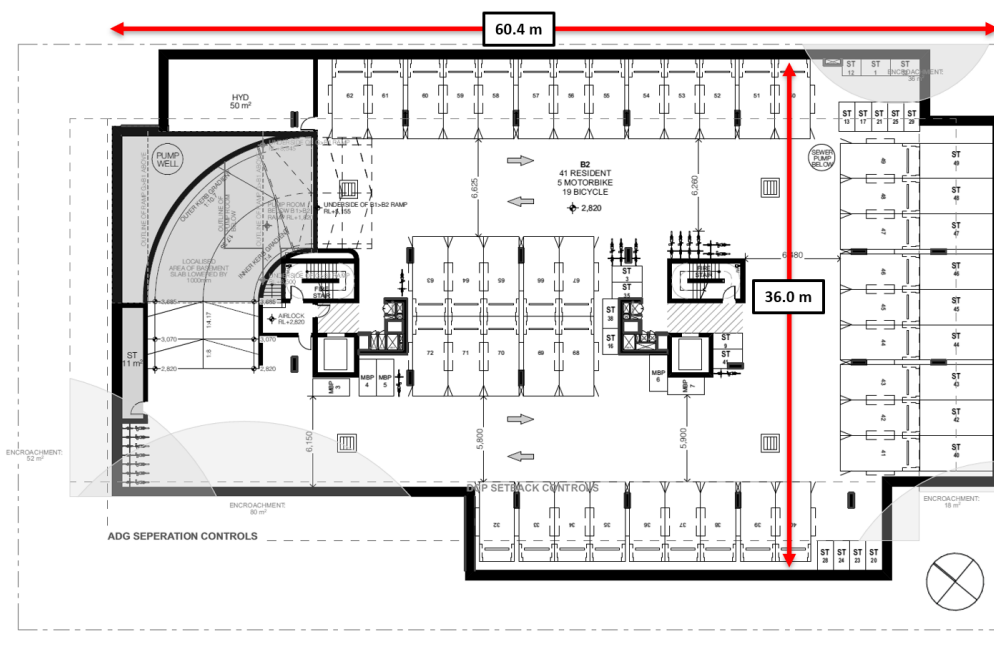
Proposed Basement Dimensions (area 1947.0 m², perimeter 193.0 m)
